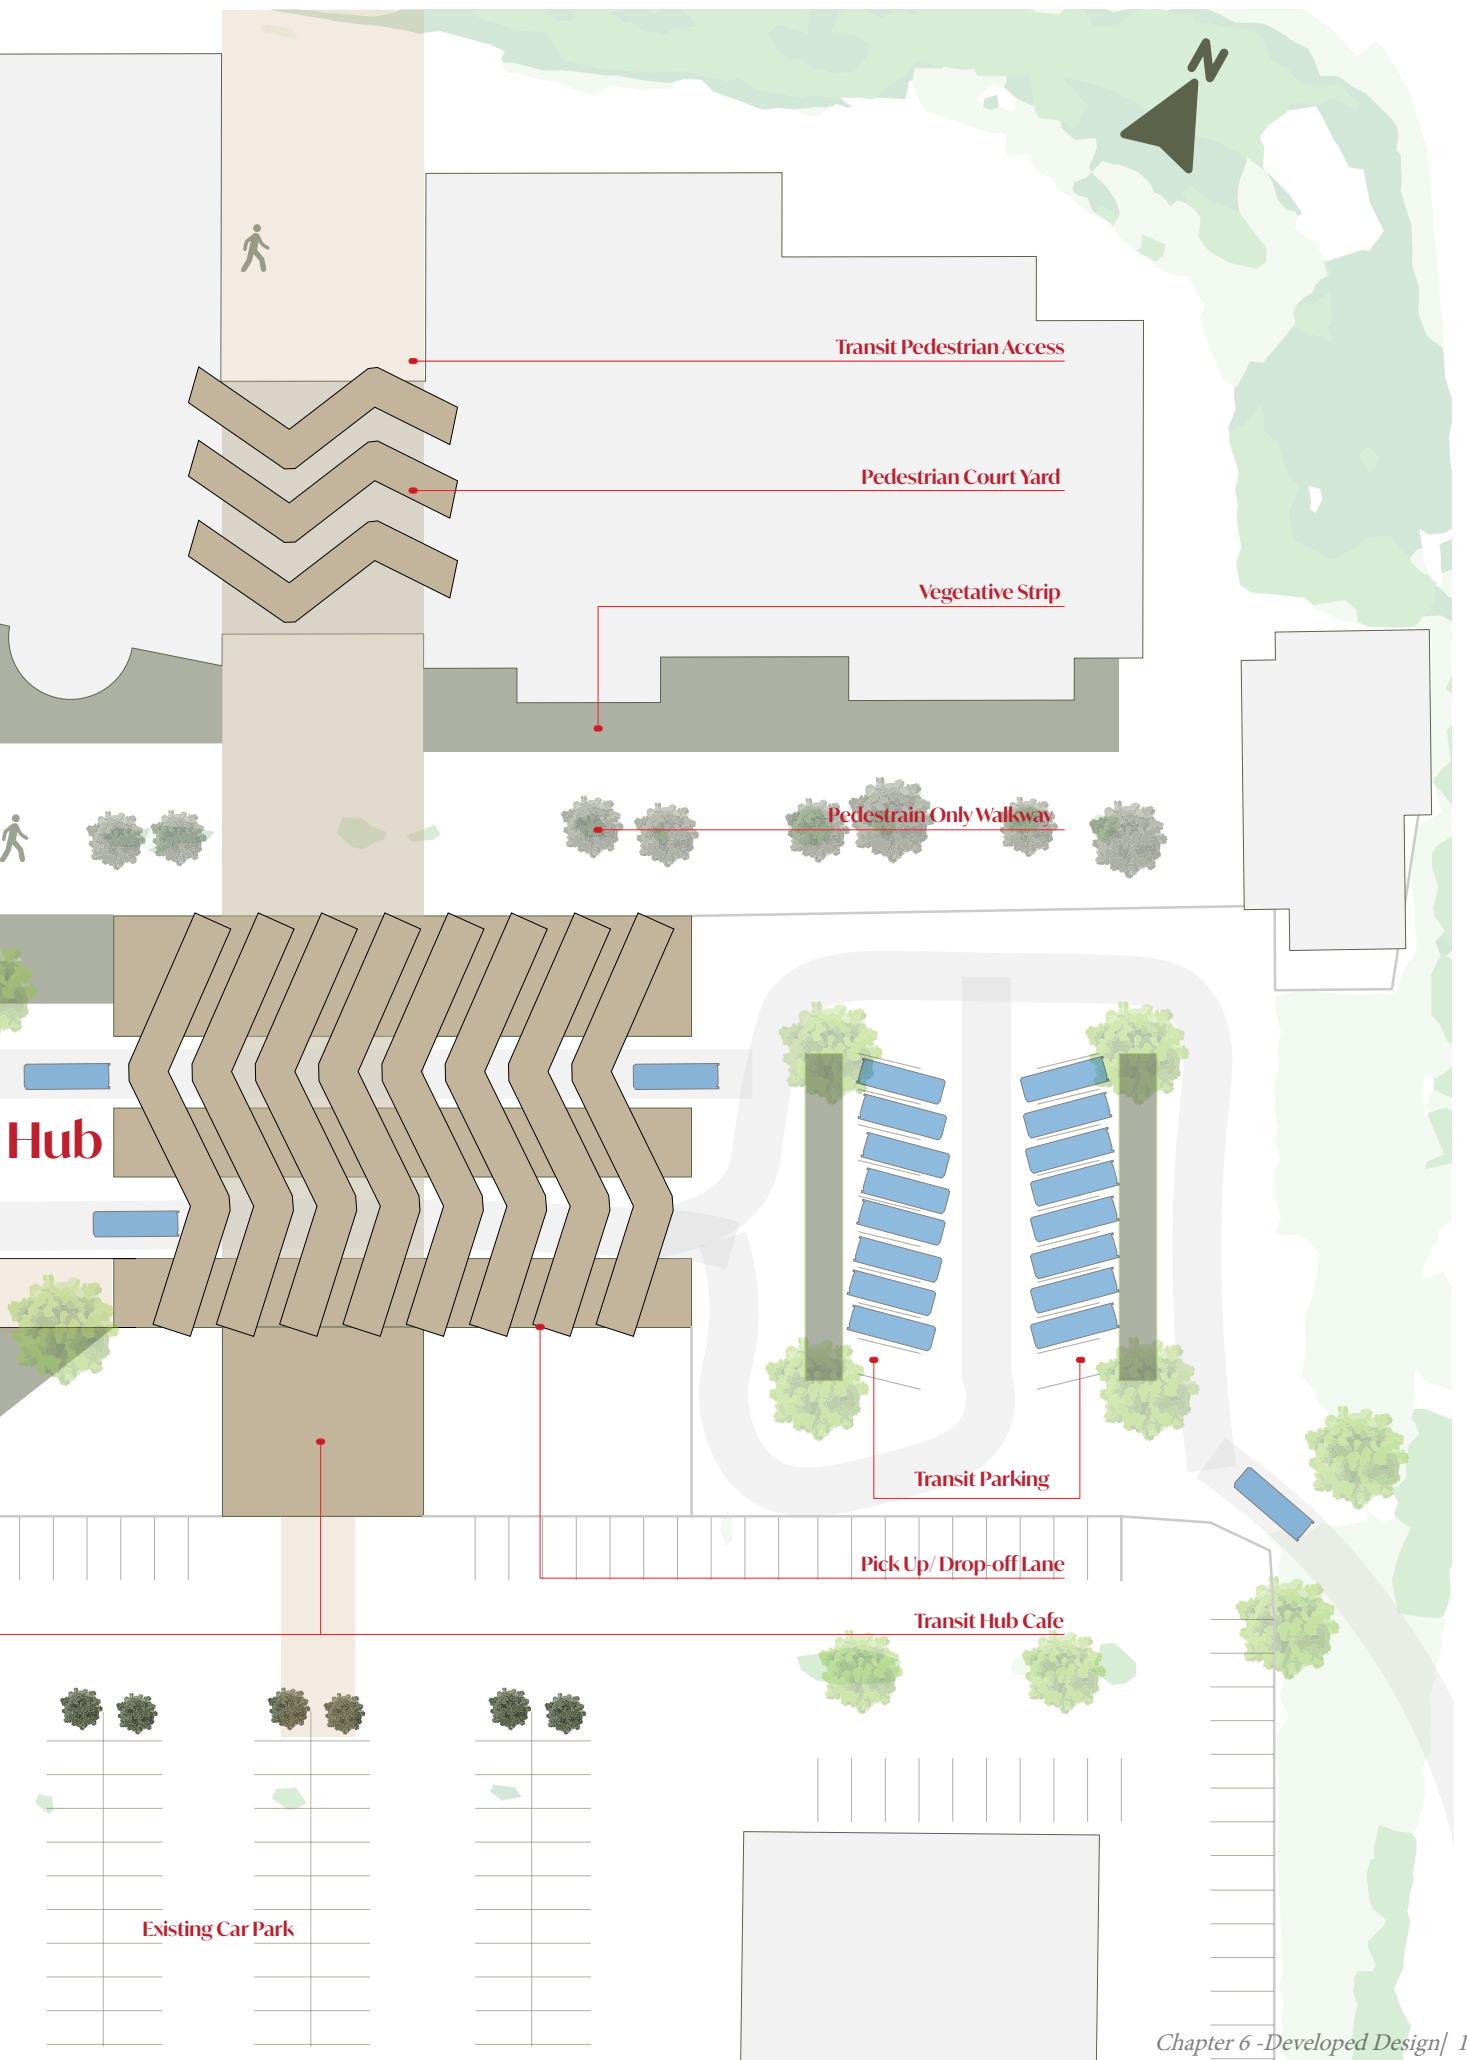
Transit-Oriented Site Plan (2025), Authors Artwork
